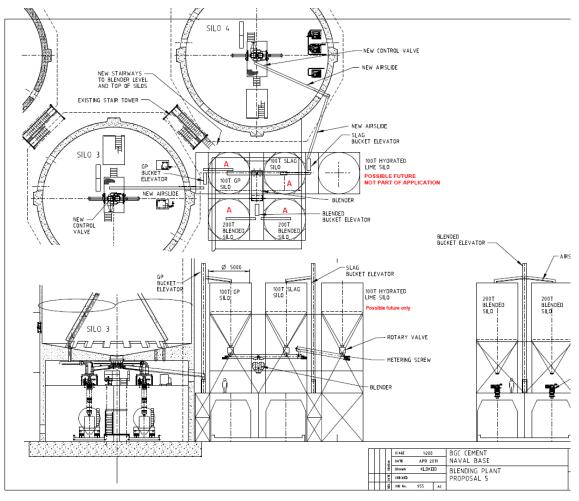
BGC Cement Naval Base – site plan of blending plant and silos (A)
